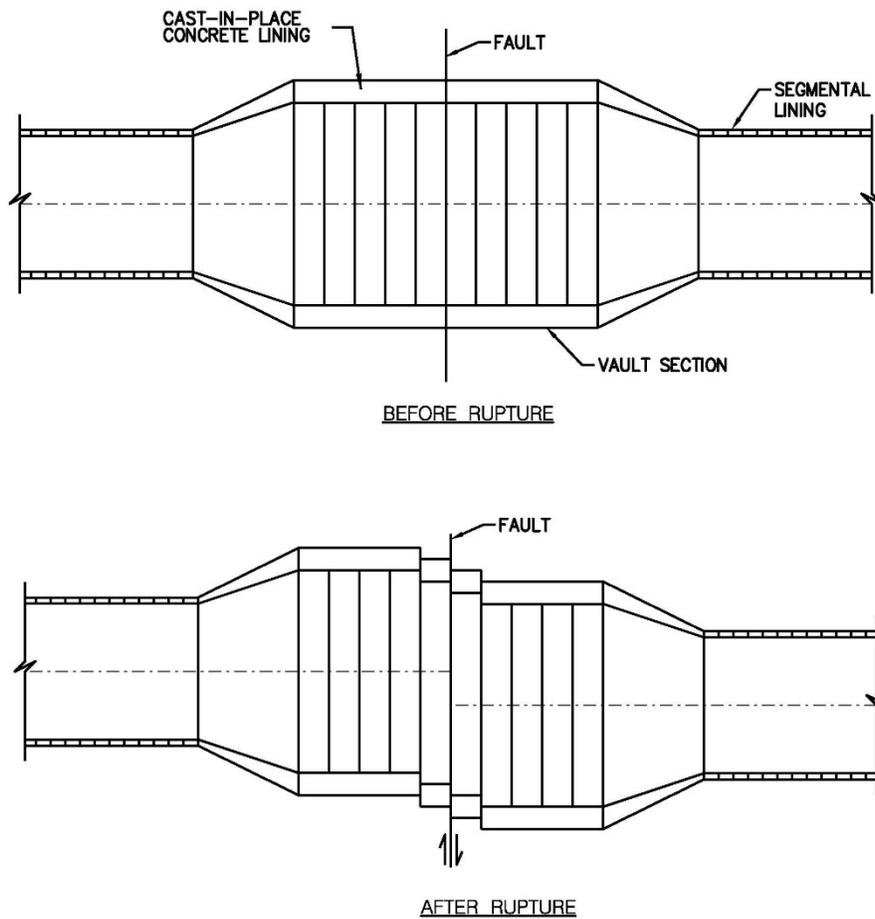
Plan Layout of the Vault, Demonstrating the Slinky Articulation Concept (JA, 2014f)
